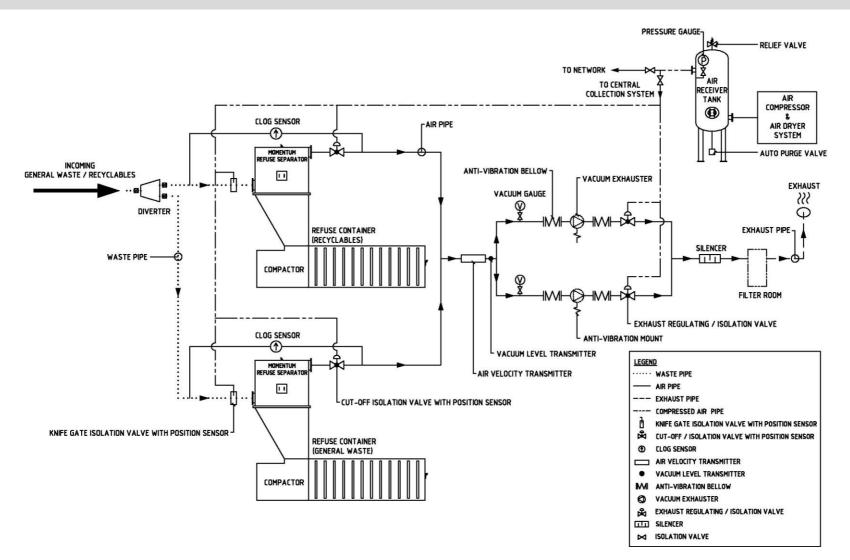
An example of an exhaust air pipe layout (in parallel)
